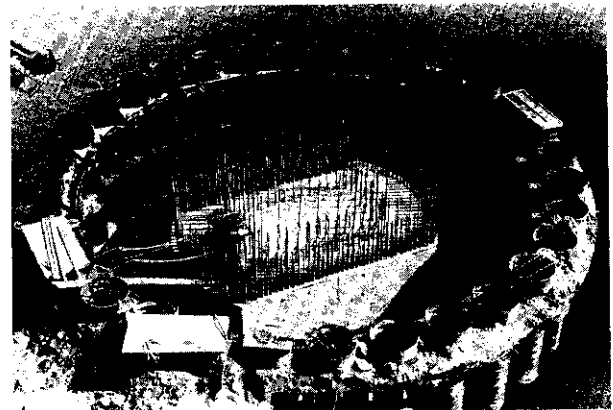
Walled steel pipe pile well method applied in heavy bridge foundation
